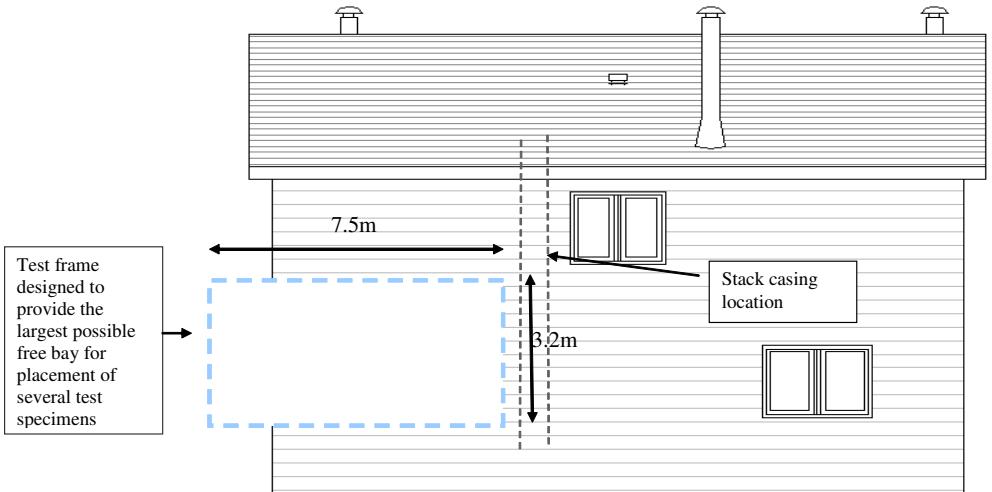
Schematic of the Field Exposure of Walls Facility (FEWF).
